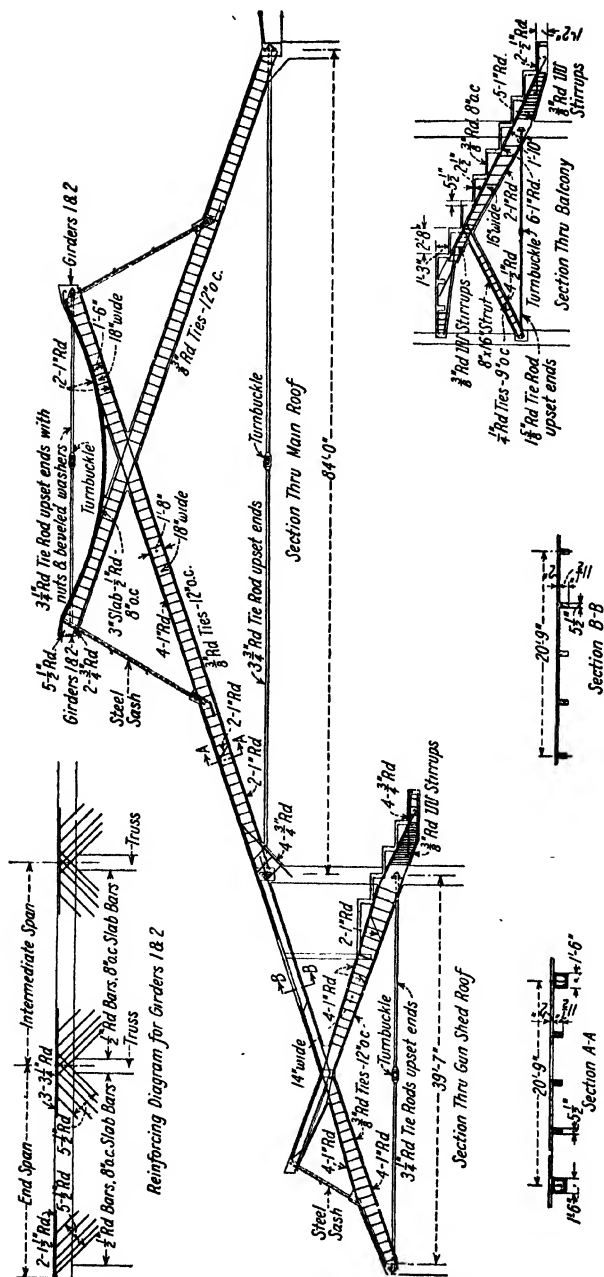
Details of Long Span Roof Construction in Armory at Danville, Ill. (See p. 671.)
